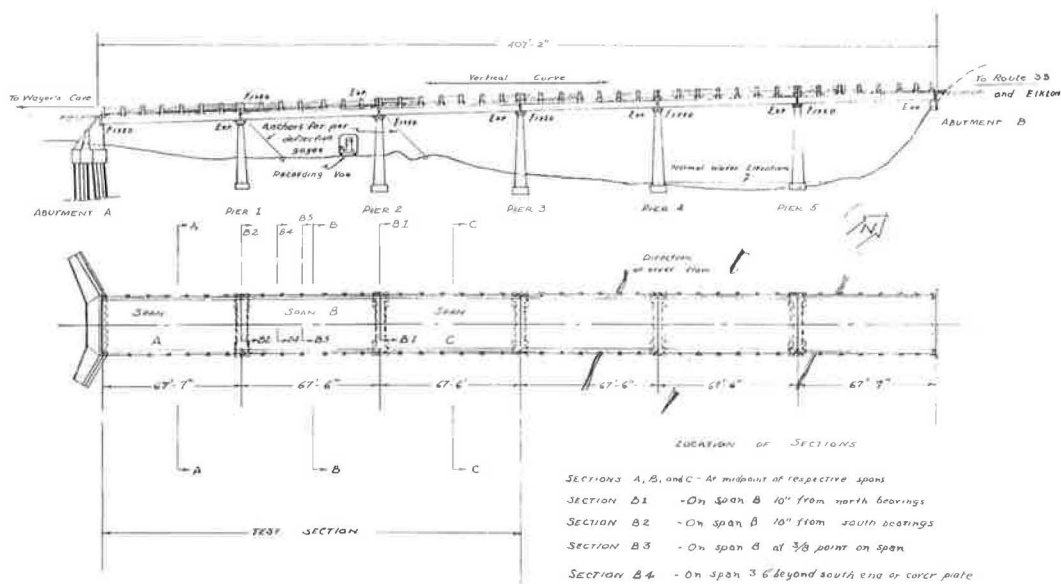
Profile and plan of Weyer's Cave Bridge, indicating test sections.
